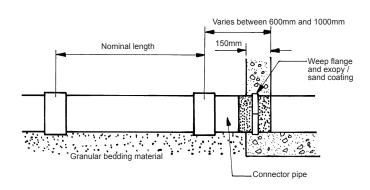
Standard connection. Manhole connector cast in concrete for non pressure applications
